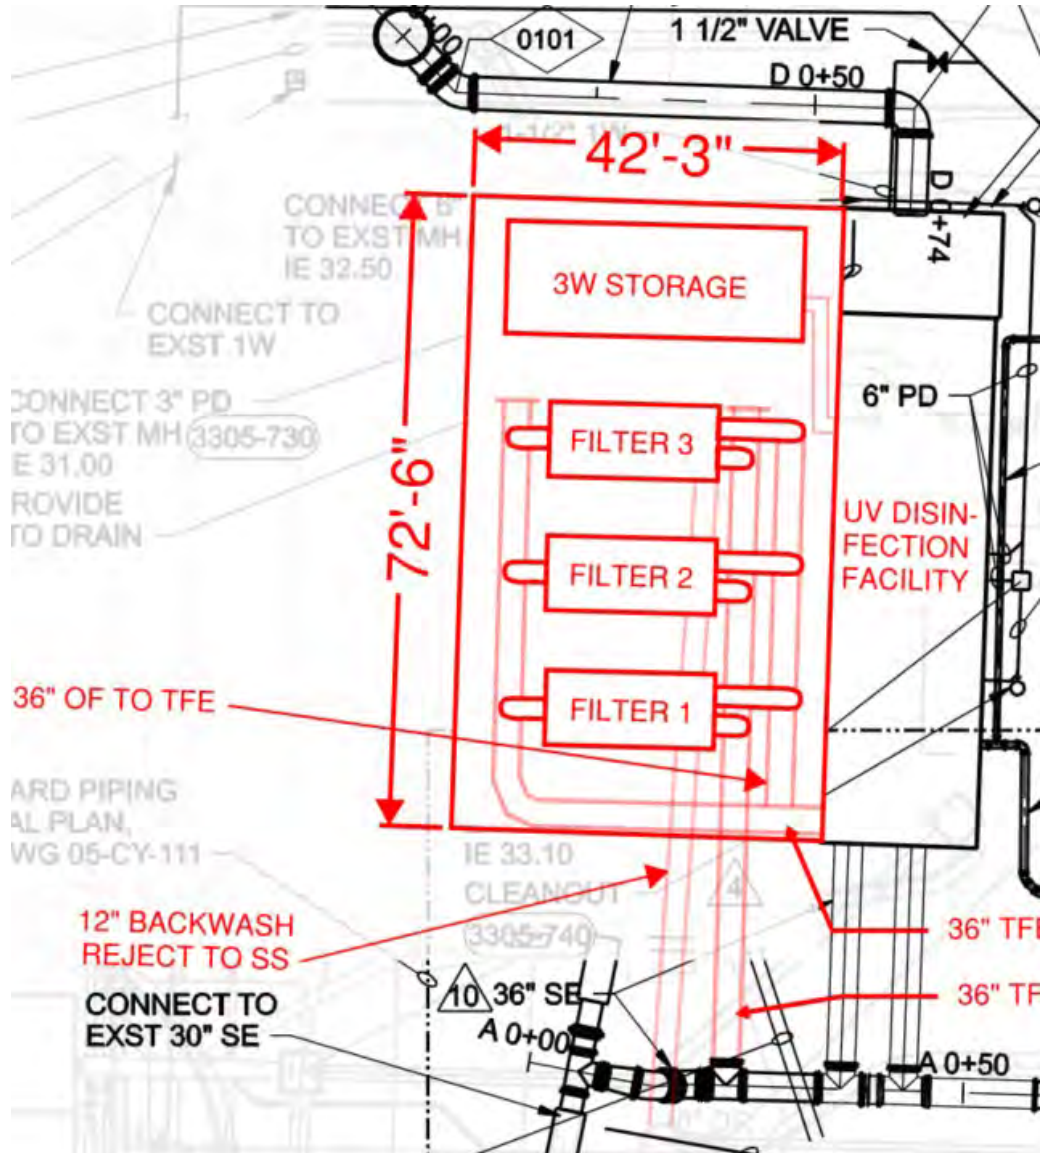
Tertiary Filtration Facility Conceptual Layout - Plan View
